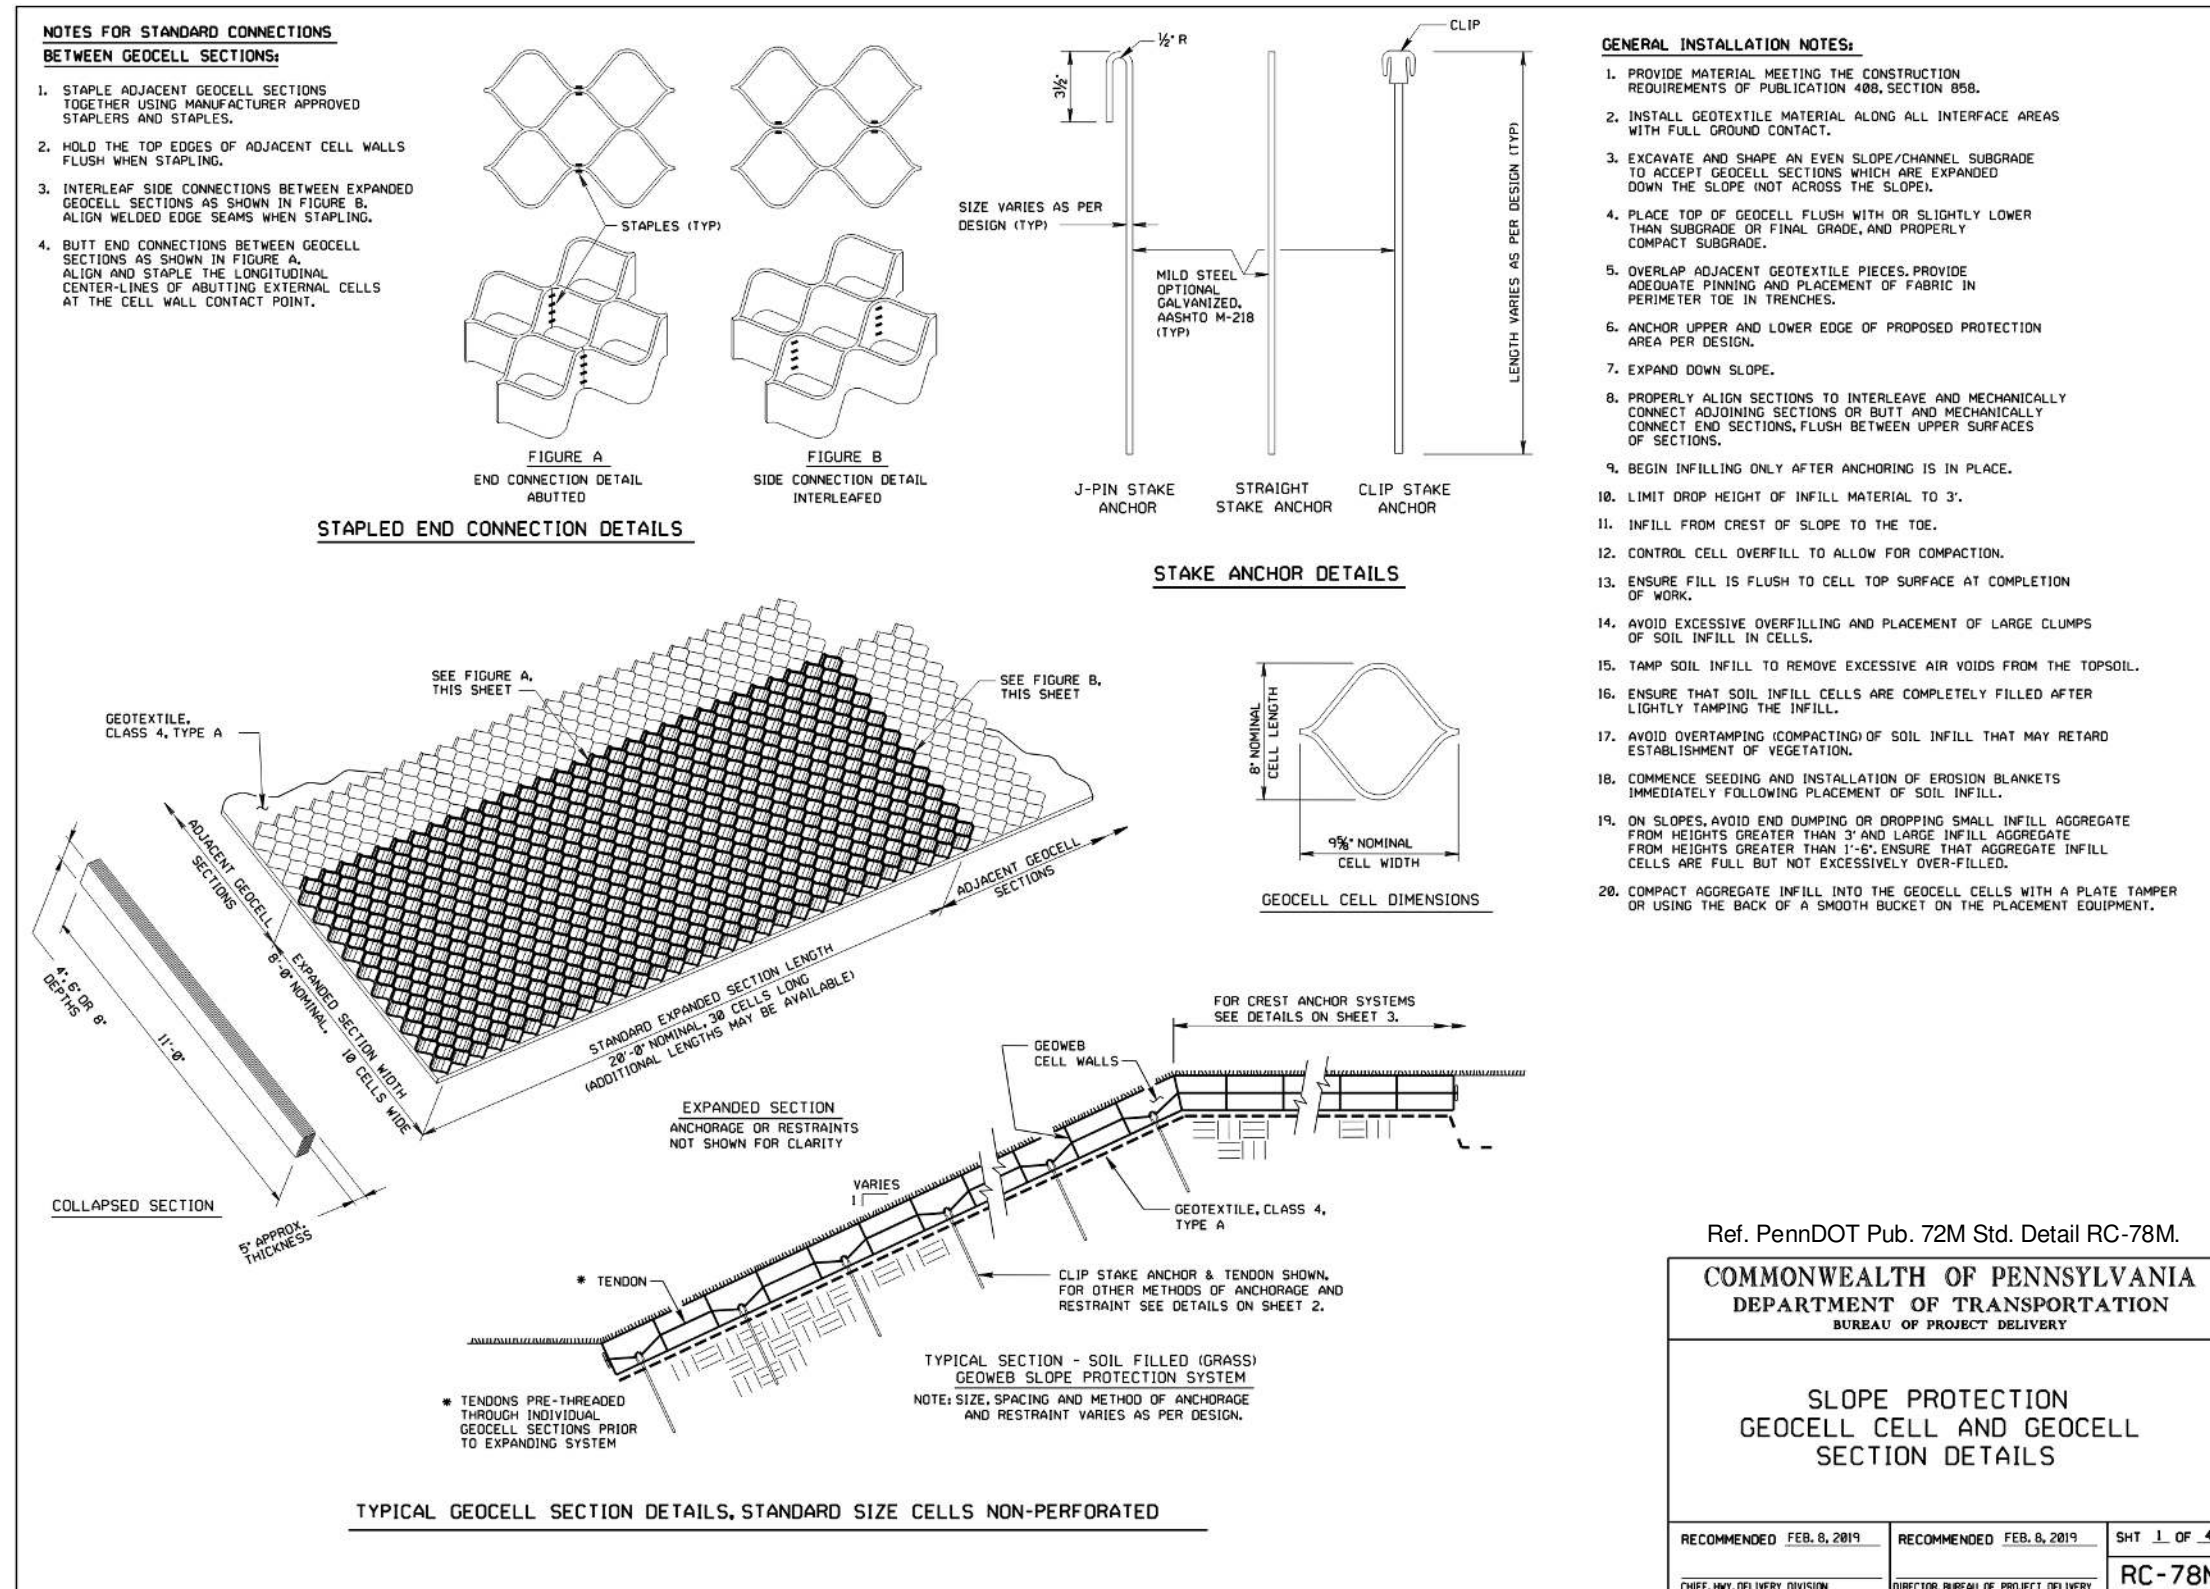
Typical Detail, Geocell (Sheet 1 of 4)
